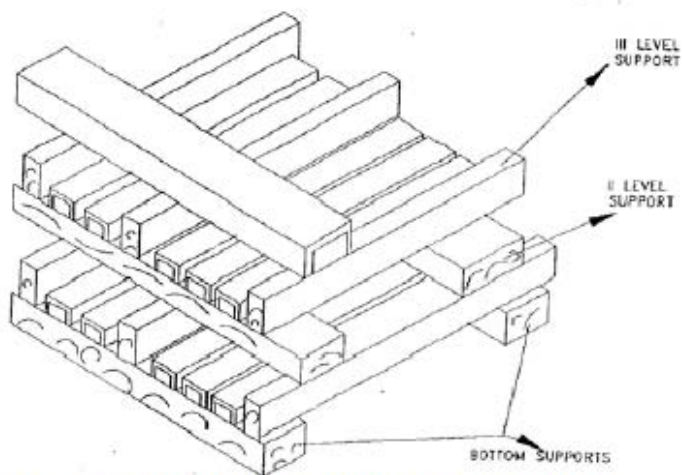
STRUCTURAL STEEL STACKING ARRANGEMENT
